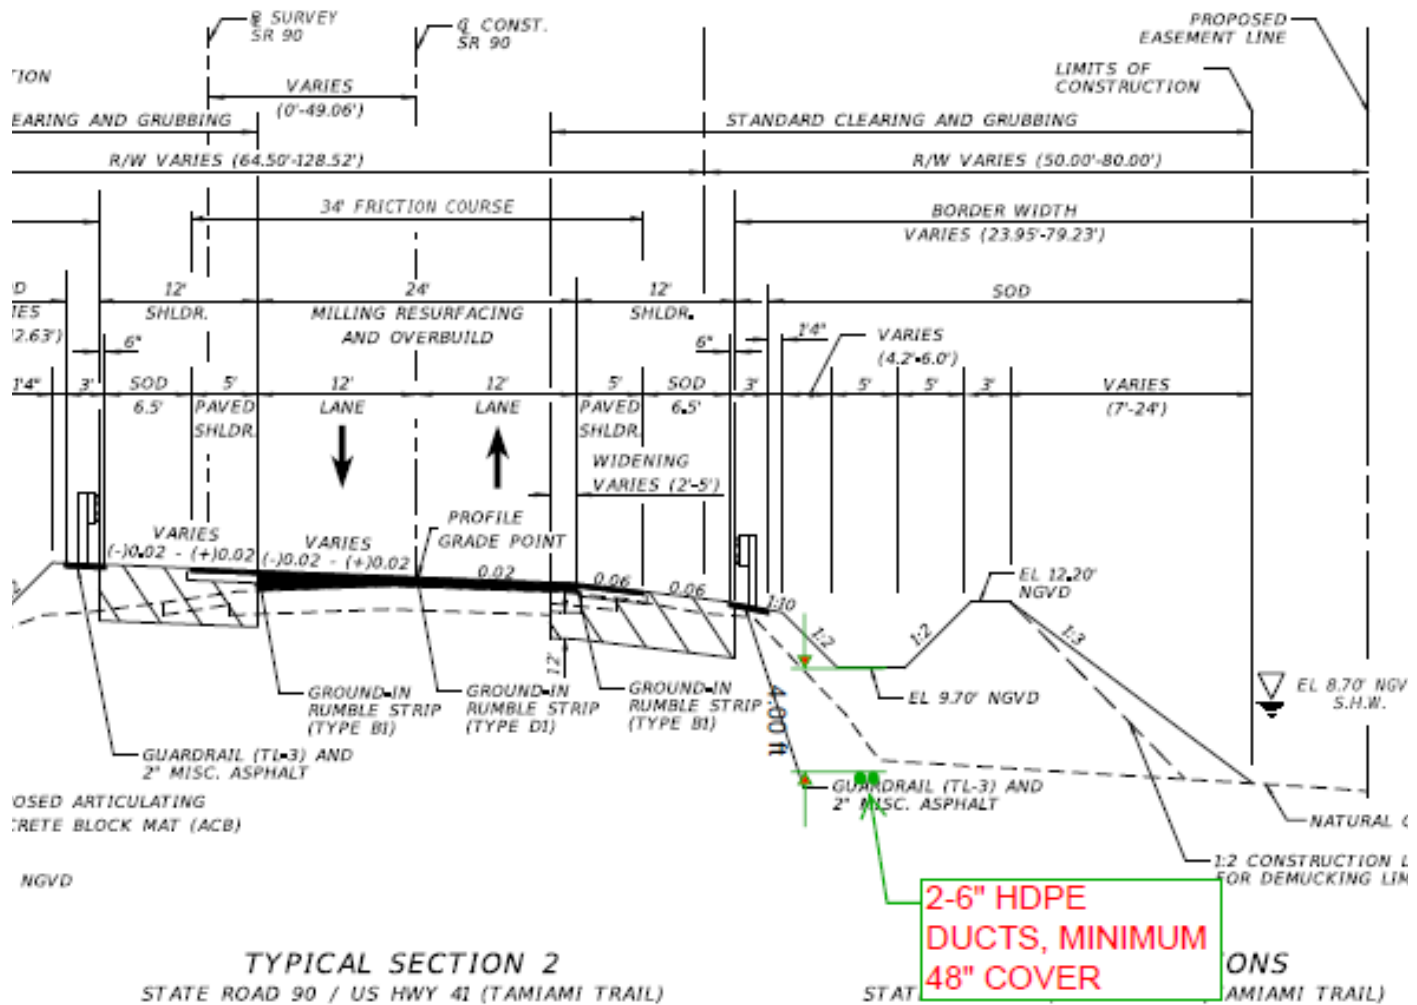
Cross section showing location of underground powerlines. Green circles show the location of the two conduits that will be placed at the bottom of the stormwater swale system.
